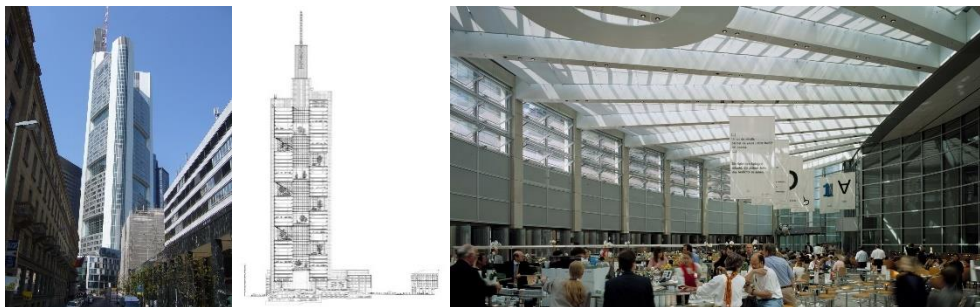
(a) Commerzbank Office Building, Norman Foster& Partners, 1997, Frankfurt, Germany [ULR 9]; (b) Commerzbank Office Building Cross Sections of Greenhouses [ULR 9]; (c) Commerzbank Office Building Interior Space Double-Skin Façade System View [ULR 9].
